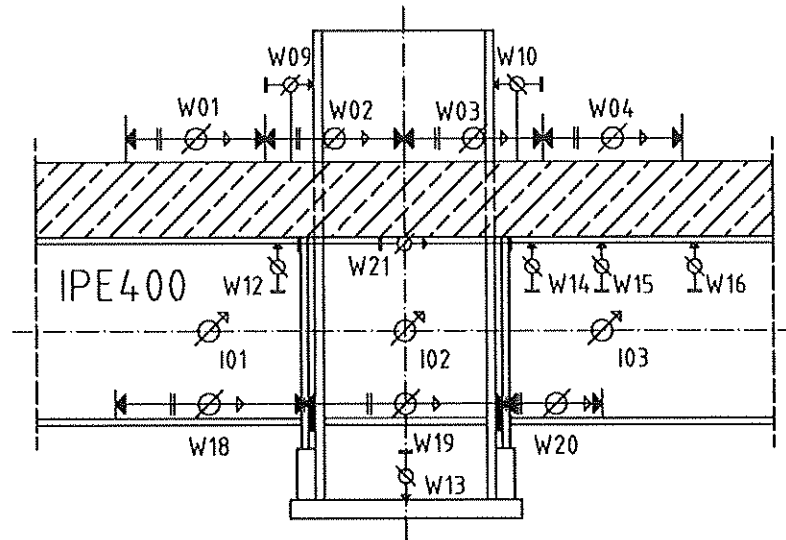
Measurement campaign for each test setup [Hahn 2009]
